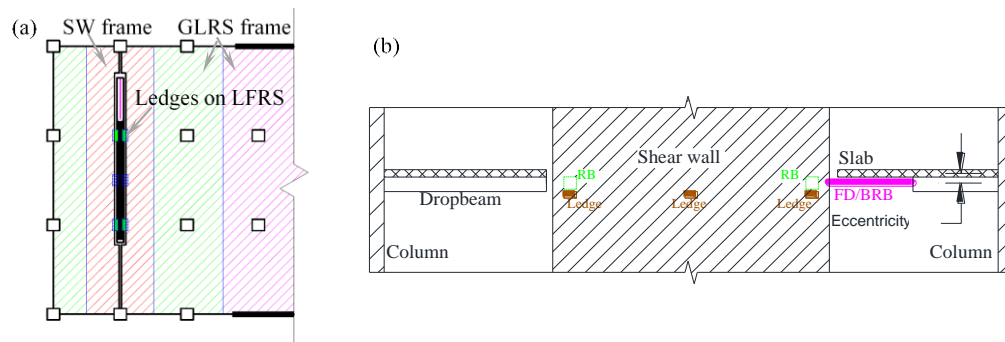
Ledge Case: (a) plan view; (b) elevation view.
